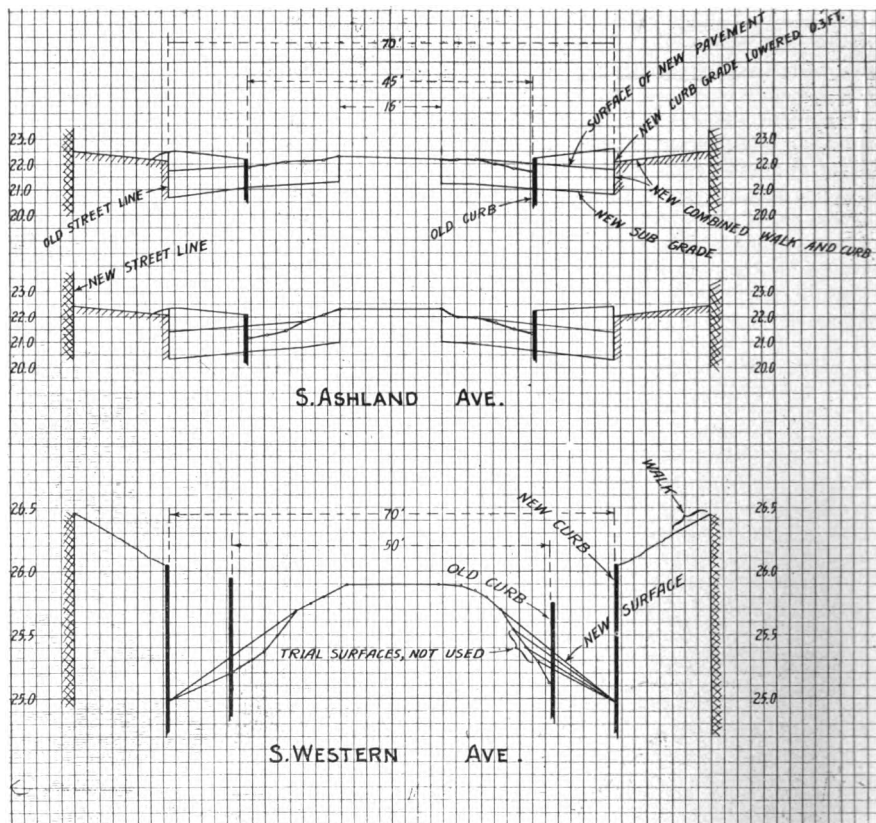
TYPICAL CROSS SECTIONS MADE FOR STUDYING STREET-WIDENING PROJECTS.
